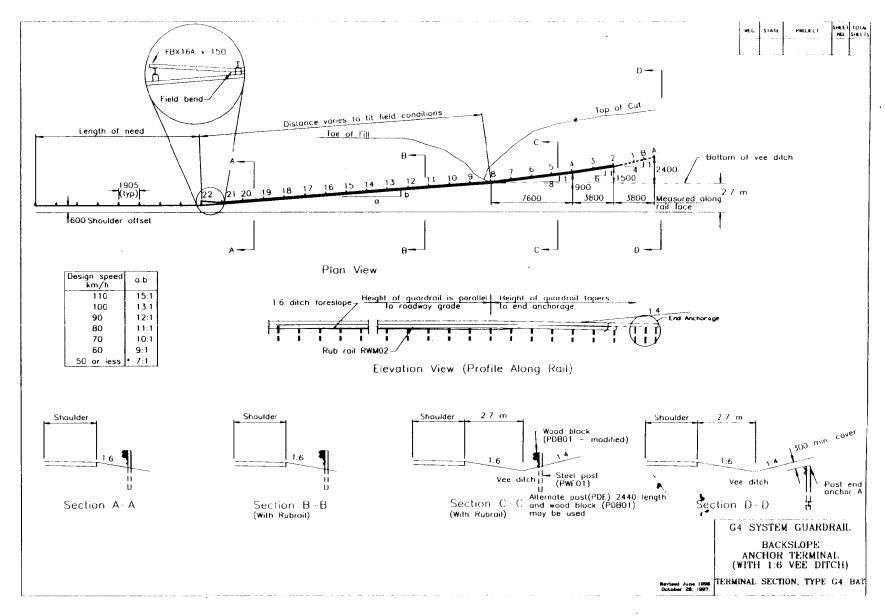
Details of the G4 W-beam guardrail buried-in-backslope anchor terminal installation.
